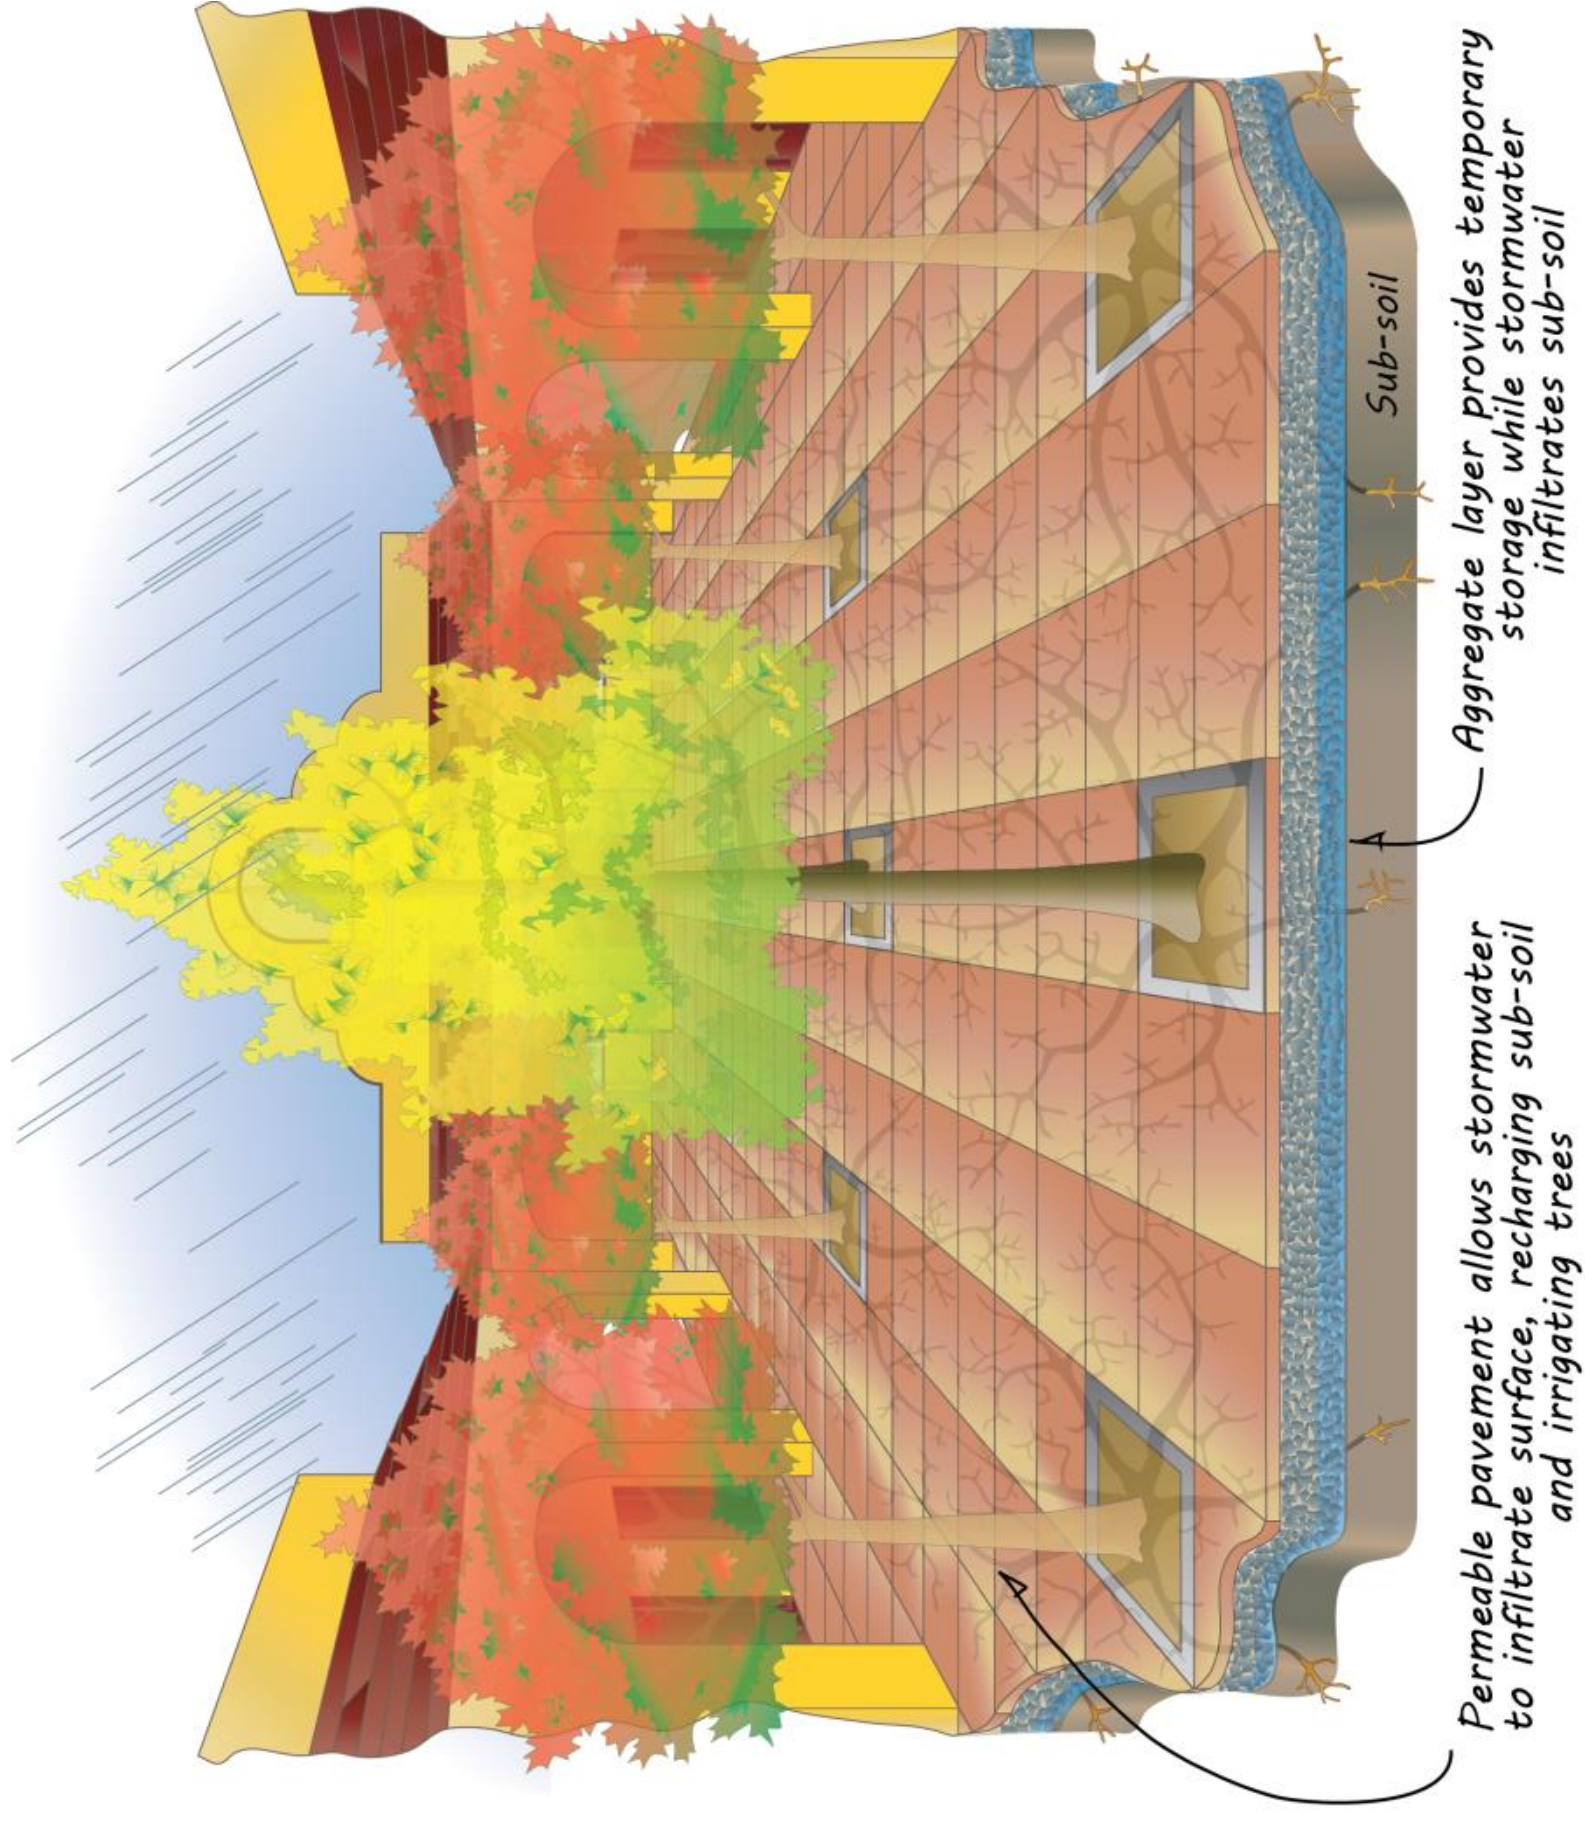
Pervious pavements allow stormwater and oxygen to infiltrate the surface, promoting tree health and groundwater recharge.
